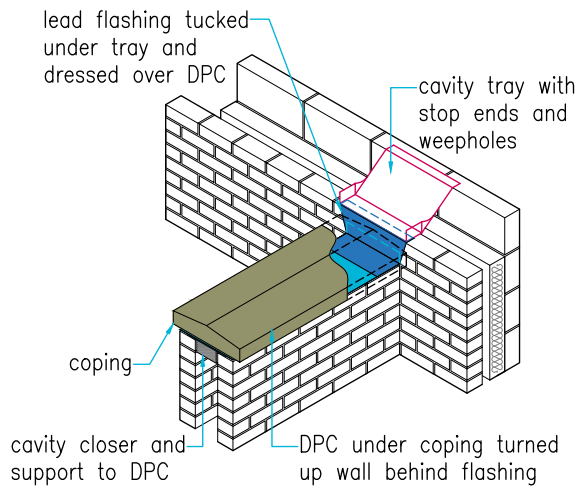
Parapet to external wall junction - DPC/cavity tray arrangement
